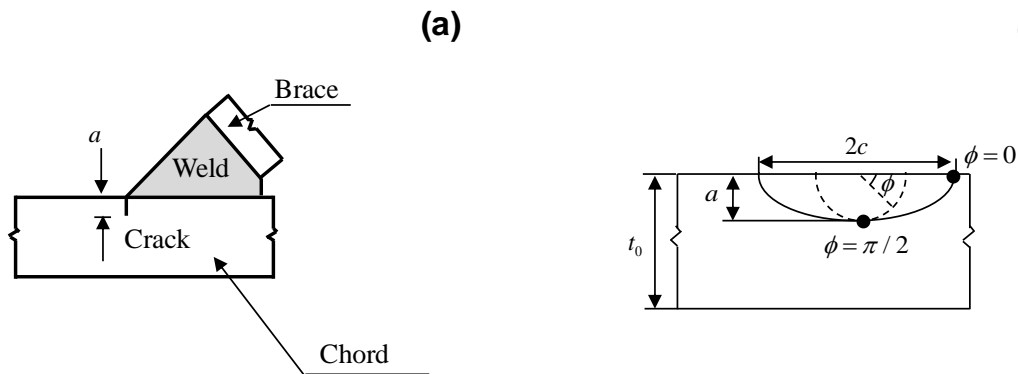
Cracks located at the weld toe for CHS K-joints: (a) location and (b) profile.
